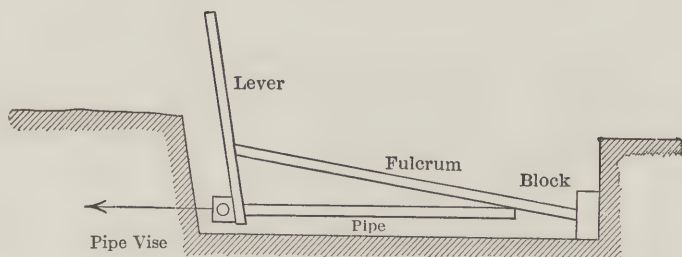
IMPROVISED APPARATUS FOR DRIVING SUPPLY PIPE INSTEAD OF DRILLING OR TRENCHING FOR IT
